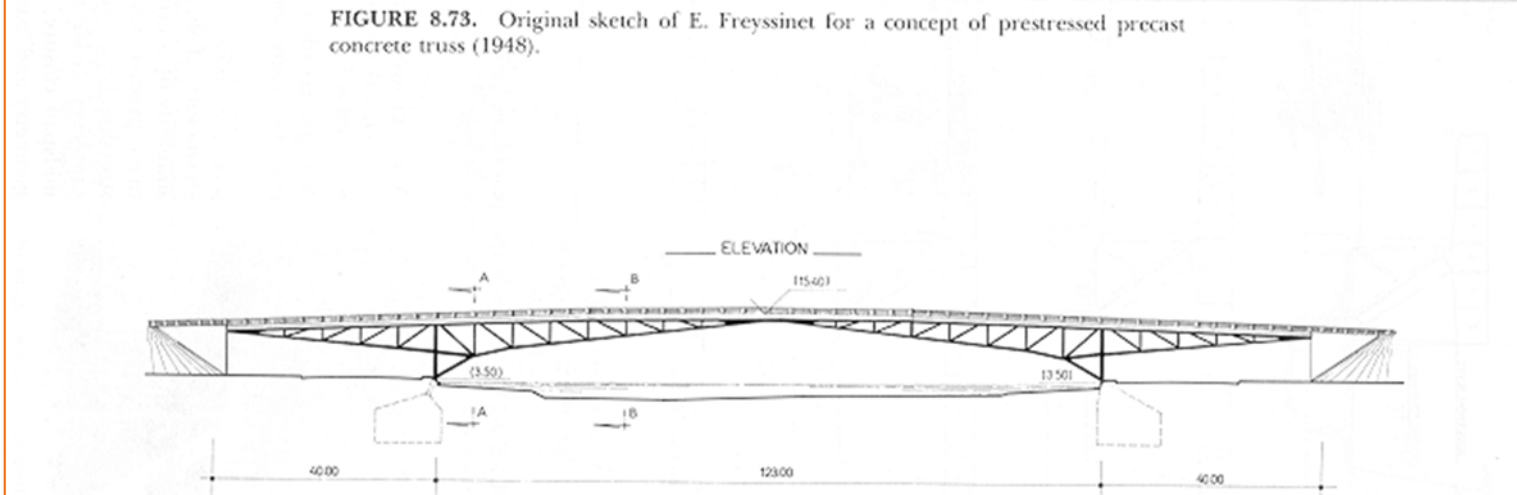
Original sketch of E. Freyssinet for a concept of prestressed precast concrete truss (1948).
